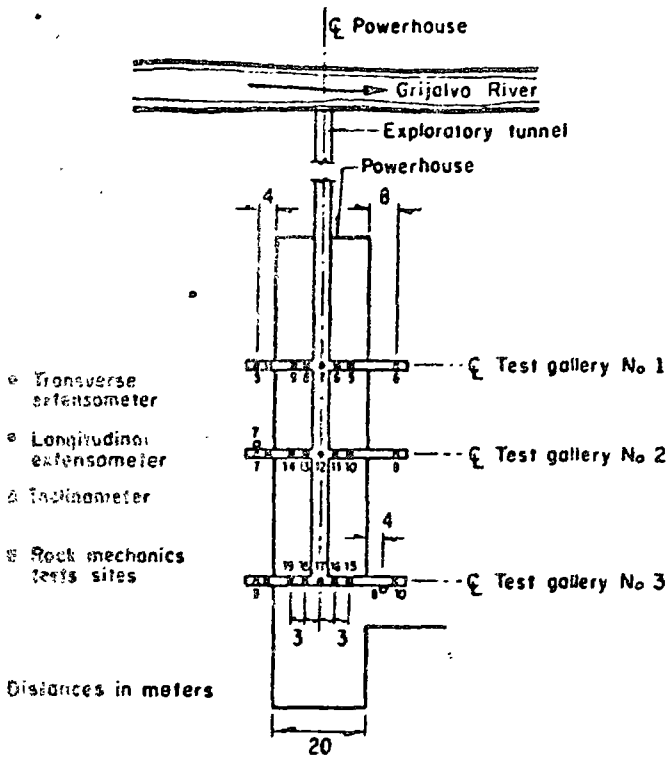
Localization in plant of the powerhouse, the instrumentation and the rock mechanics tests sites
